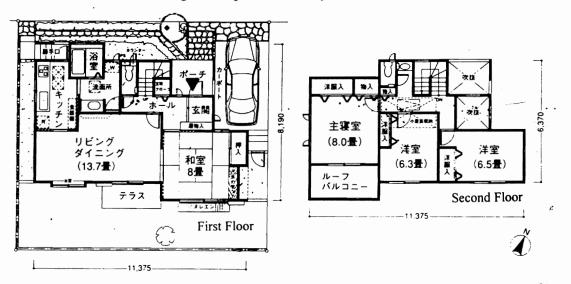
Typical Developer-built House in Japan - Land Area : 161.09 sq.m (1733 sq.ft), Total Floor Area : 118.41 sq.m (1274 sq.ft), Price for Sale : About \$678,000 -(Source: Tokyu Construction Ltd, 1997)
